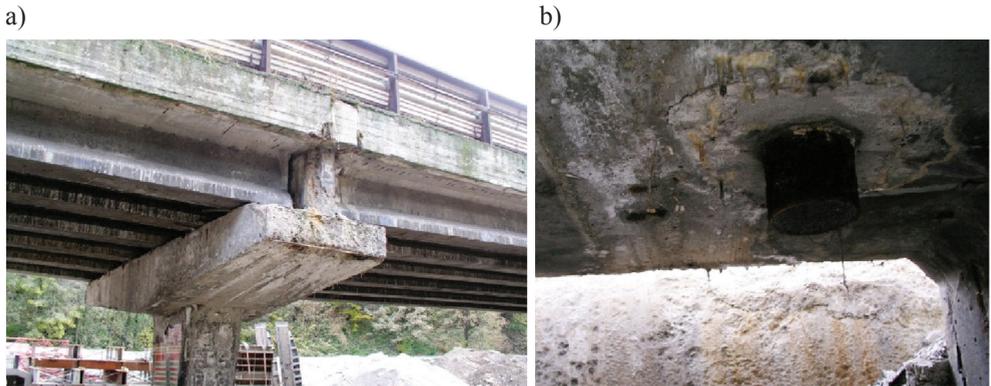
Bridge before repair: a) view of the investigated crosshead in the axis no. 15, b) non-tight collector above the pier cross-beam of bridge
